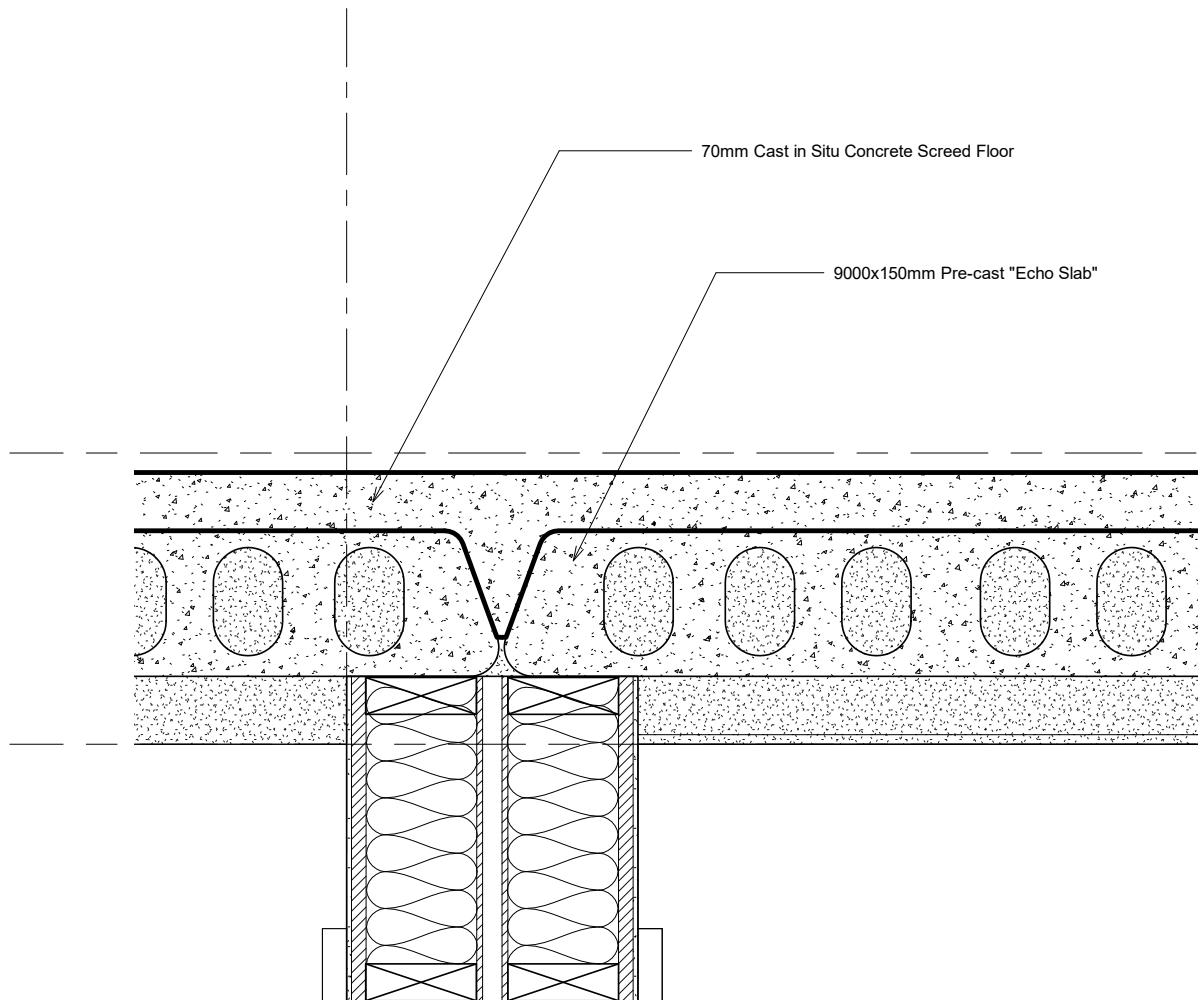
Material and Connection Details (Floor | Wall Detail) (Author, 2017)
